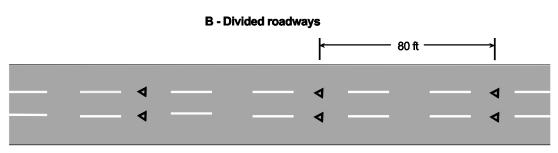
B-V2. Typical Raised Pavement Marker Layout Details (Sheet 1 of 2)
